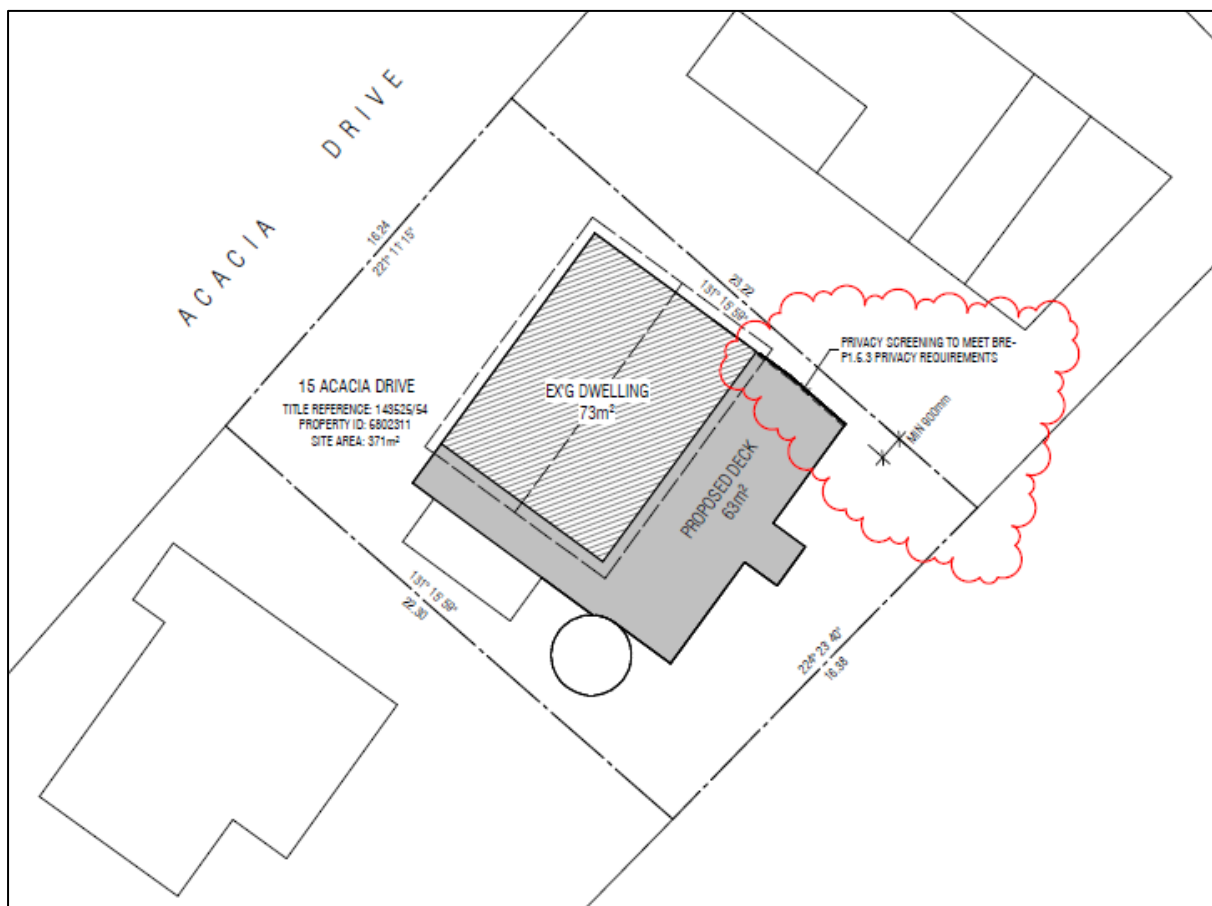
Site Plan – Existing Deck (Source: Edwards + Simpson).
